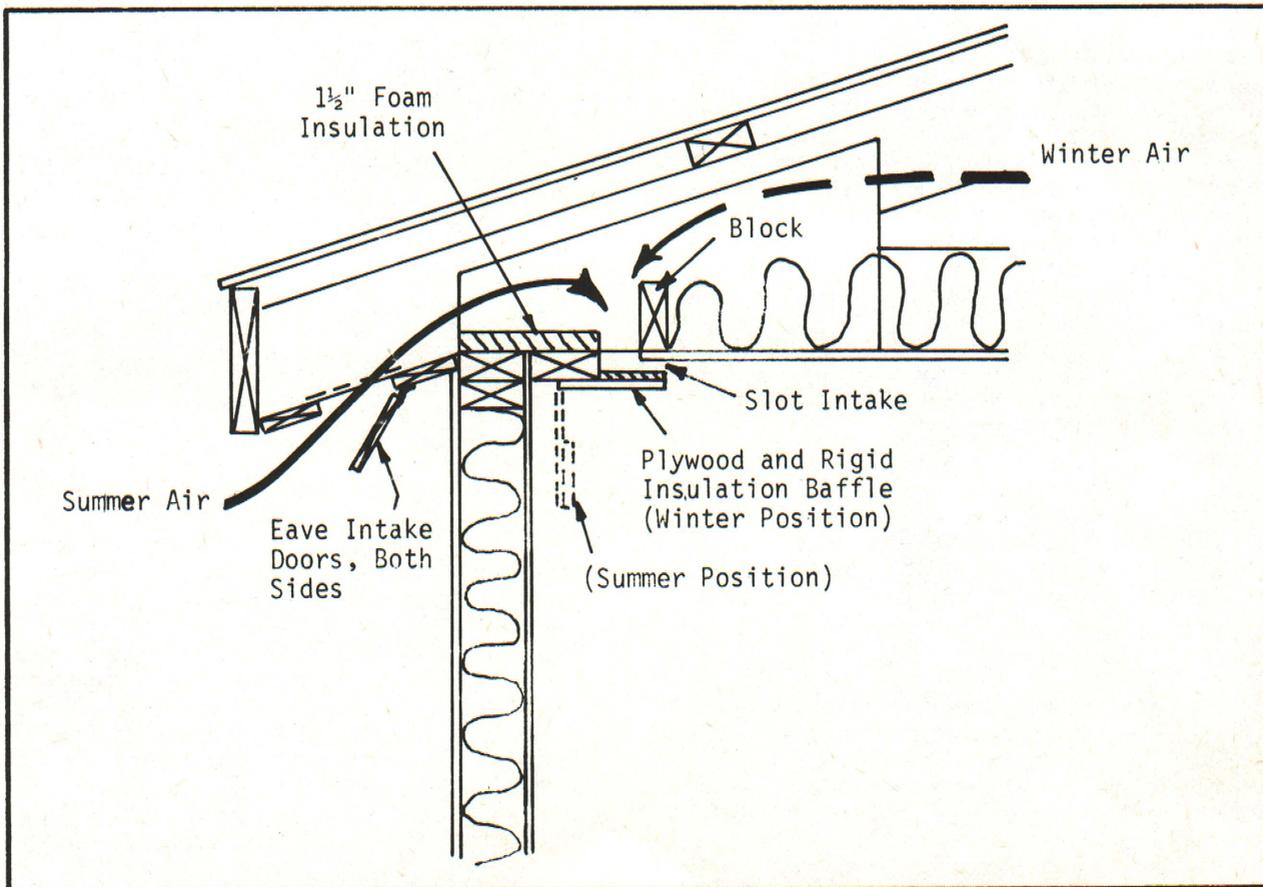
Typical eave and baffled slot intake. Source: Midwest Plan Service.
